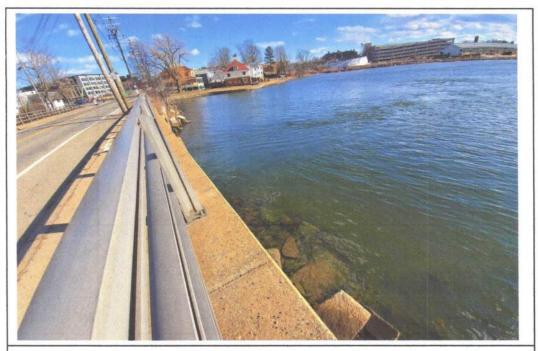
North Mill Pond, Landward Side, View Southeast from West Side of Culvert in Maplewood Road, Mid-Incoming Tide (2/28/2020)
